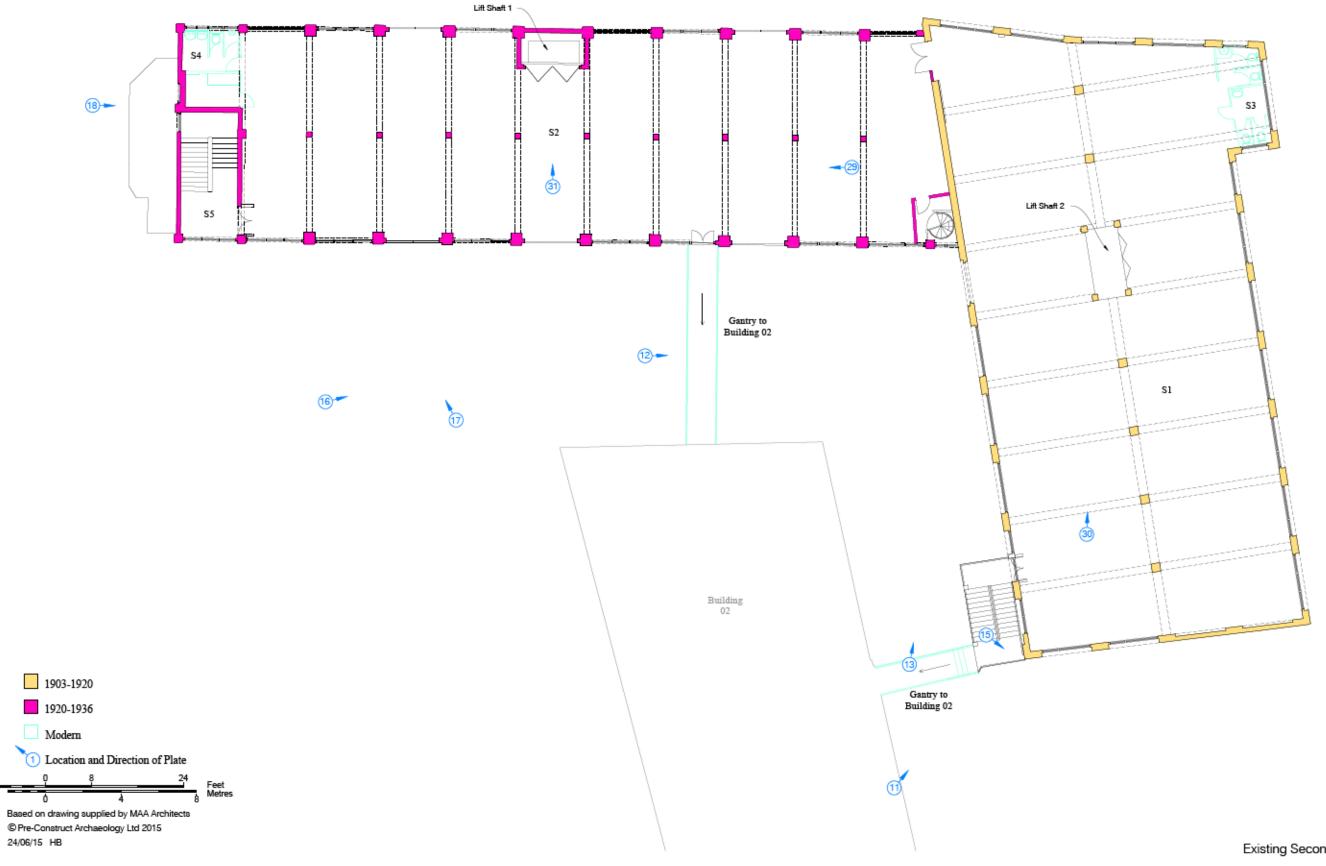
Existing Second Floor Plan of Building 03 1:200 at A3
